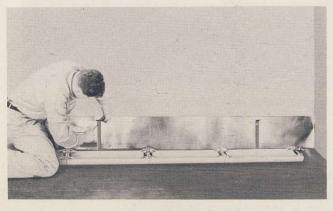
Wall brackets hold sealing strip of aluminum foil or non-asphalt paper in place.
